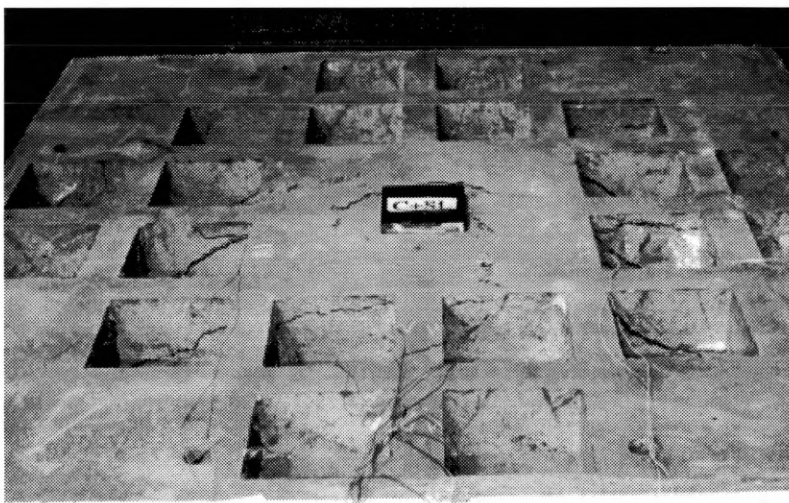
(l) Crack pattern after punching failure — slab No. 12
